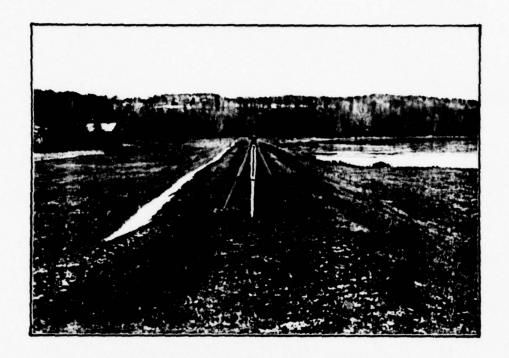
View of Dam from Junction of Embankment and Emergency Spillway
